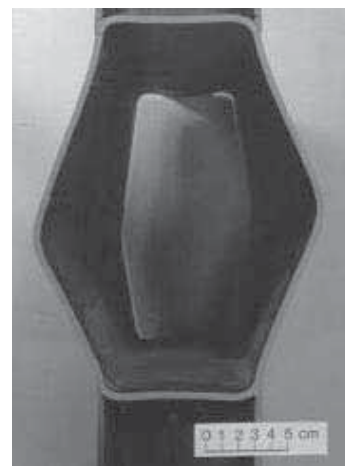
Local yielding of branch due to uneven load distribution.
